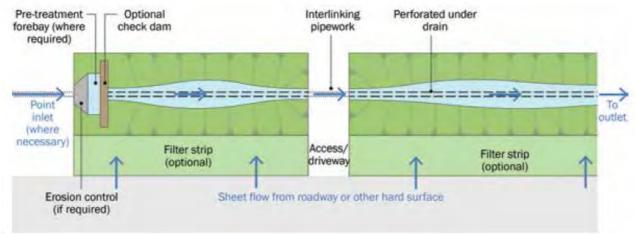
CIRIA C753 Figure 17.5 – Typical plan view of a swale
